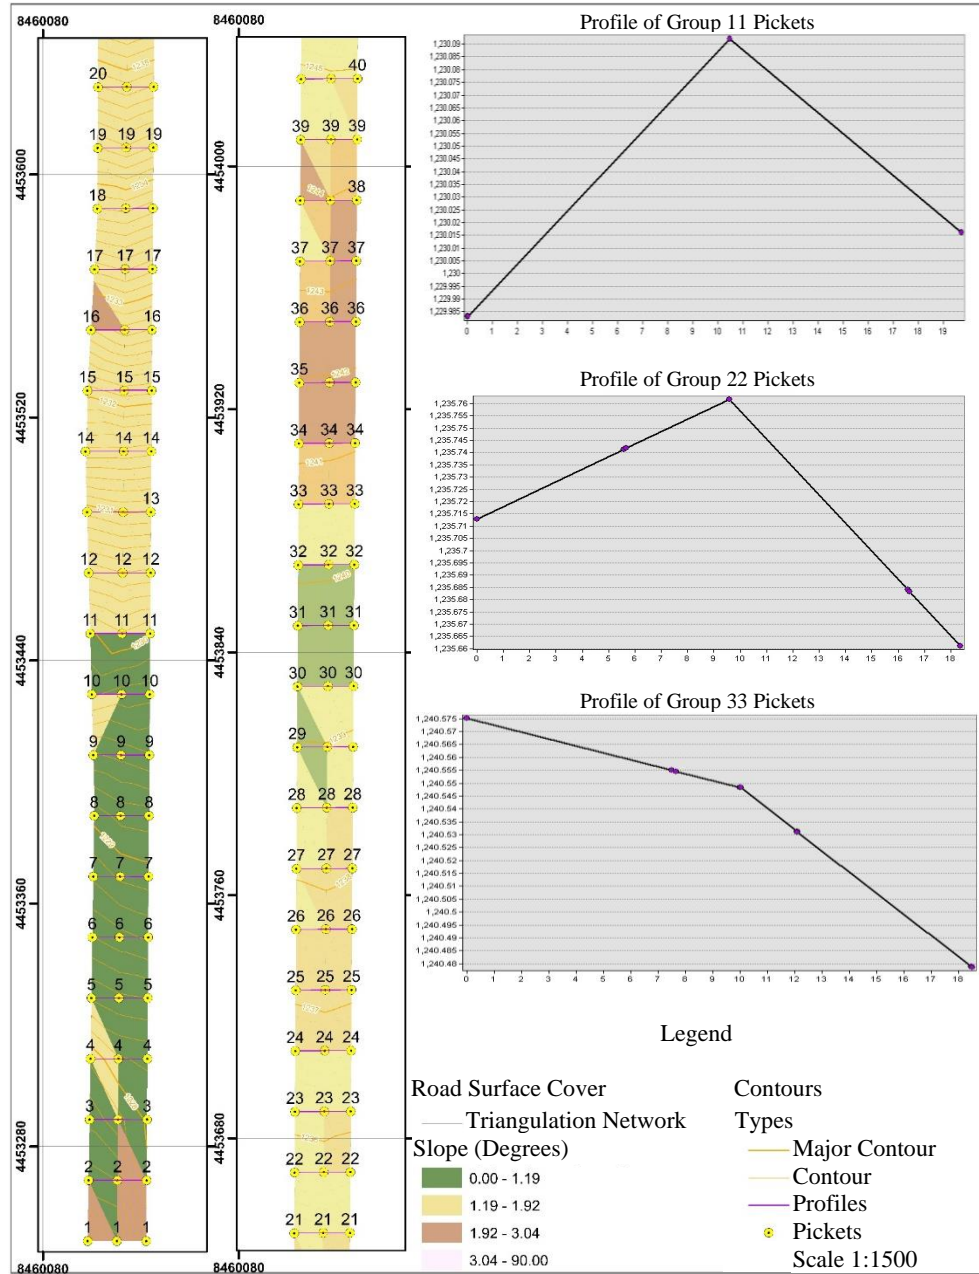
Plan of elevation data for the surface cover of stakeout points 1–40.
